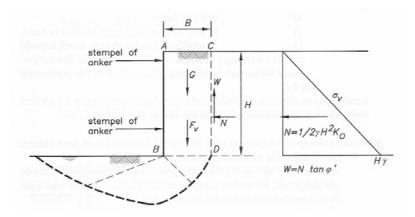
Crack of the bottom due to vertical earth pressure behind the wall
